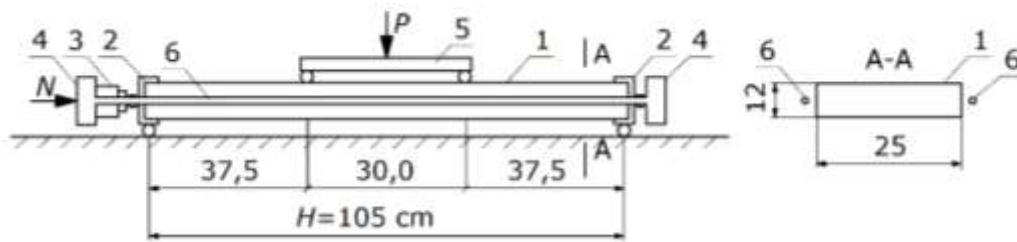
Test scheme of the experimental stone samples for compressive bending: 1 — test sample; 2 — steel heads with hinges; 3 — hydraulic jack creating force  $N$ ; 4 — traverses for fastening steel tightens and hydraulic jack; 5 — distribution beam; 6 — steel tightens with a force meter [10]
